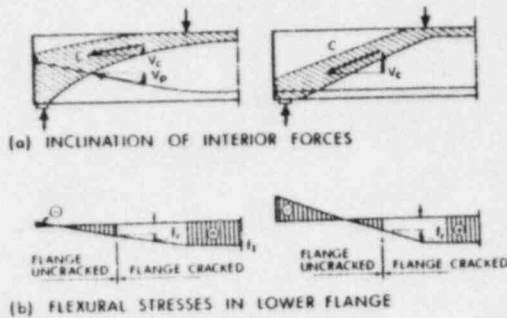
Effect of Draped Reinforcement on Interior Forces in Prestressed Beams (114)
